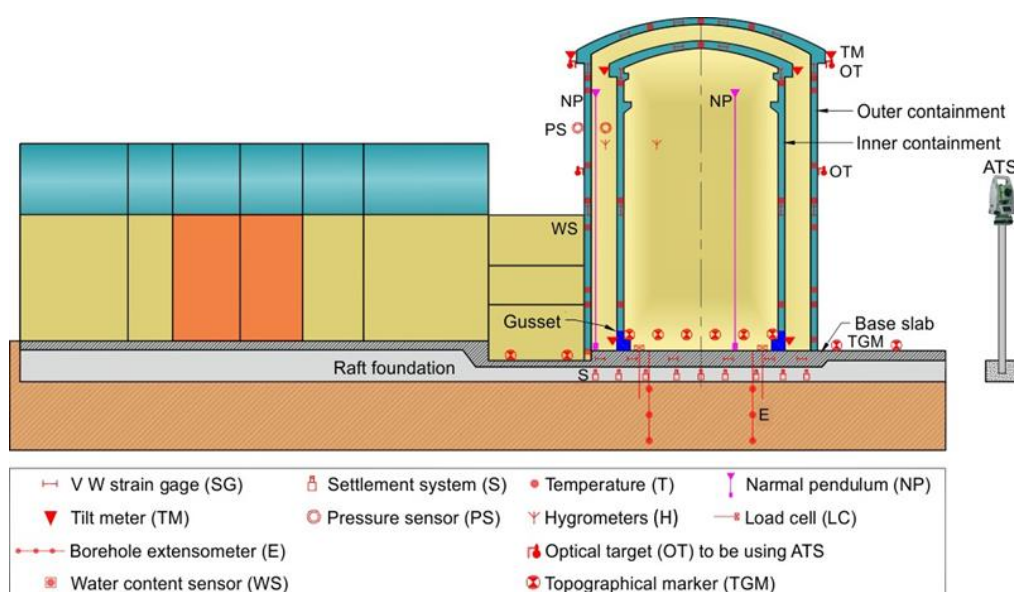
Instrumentation location plan of a Nuclear Power Plant[17]
